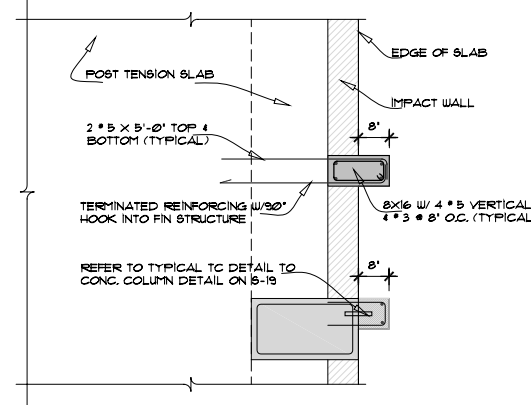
DETAIL 'A' BEAM LEDGE SUPPORTING B-29 & B-30
